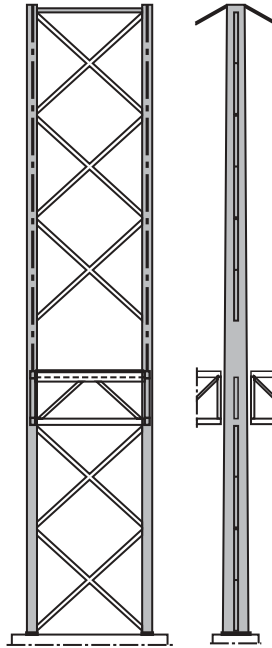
Portal-type pylon with two legs connected by cross beams
